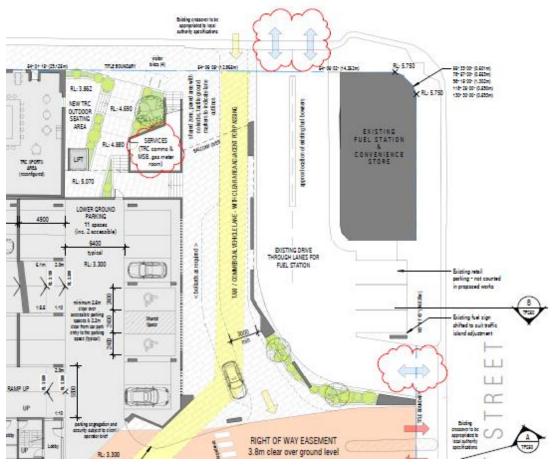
Taxi / commercial lane layout Source: CBG Architects, Dwg No. TP100-B, Stage 1 – Ground Floor Plan, Rev B, March 2019
